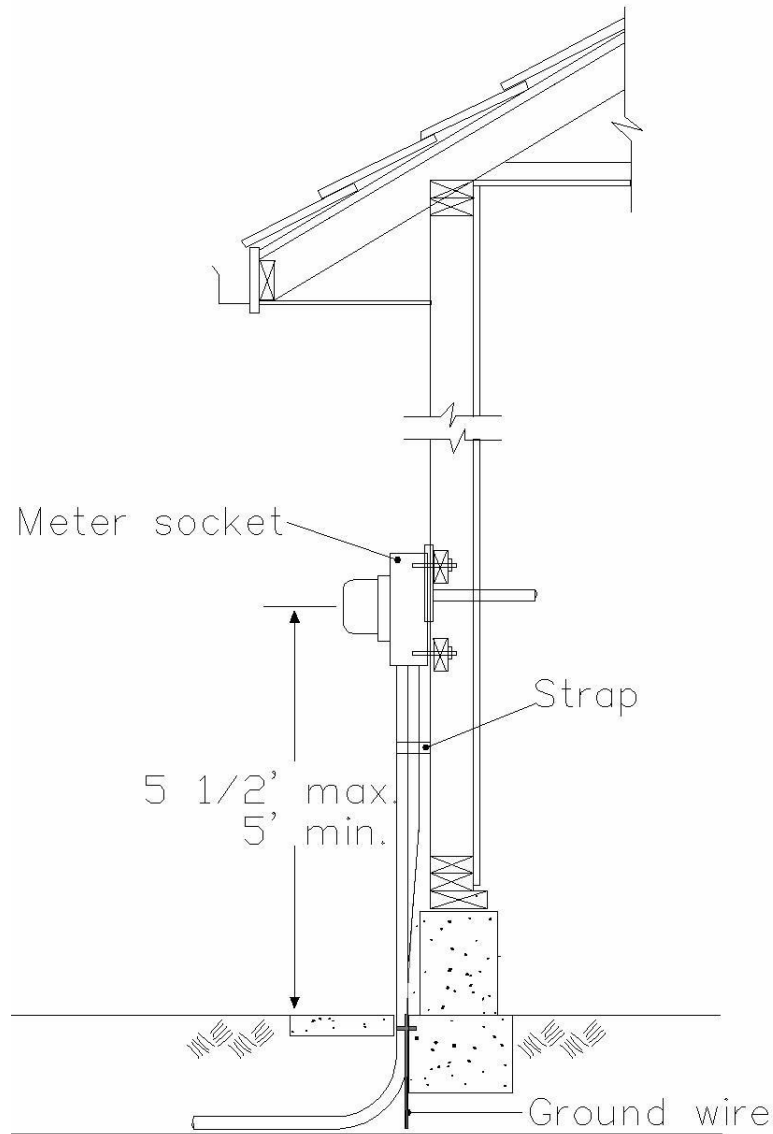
B – Splice Pit at a Wall-mounted Meter
